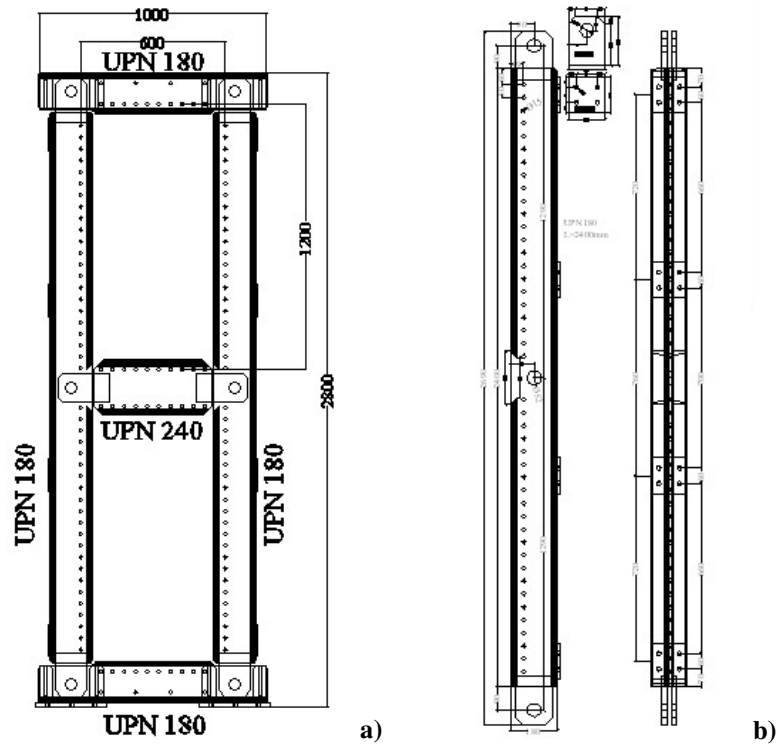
Reaction steel frame (a) and carpentry of columns (b)
